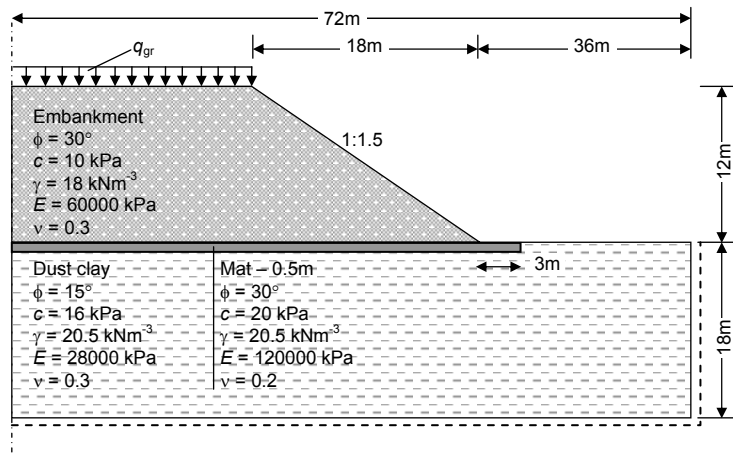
Static model of an embankment on the foundation reinforced with a mat
